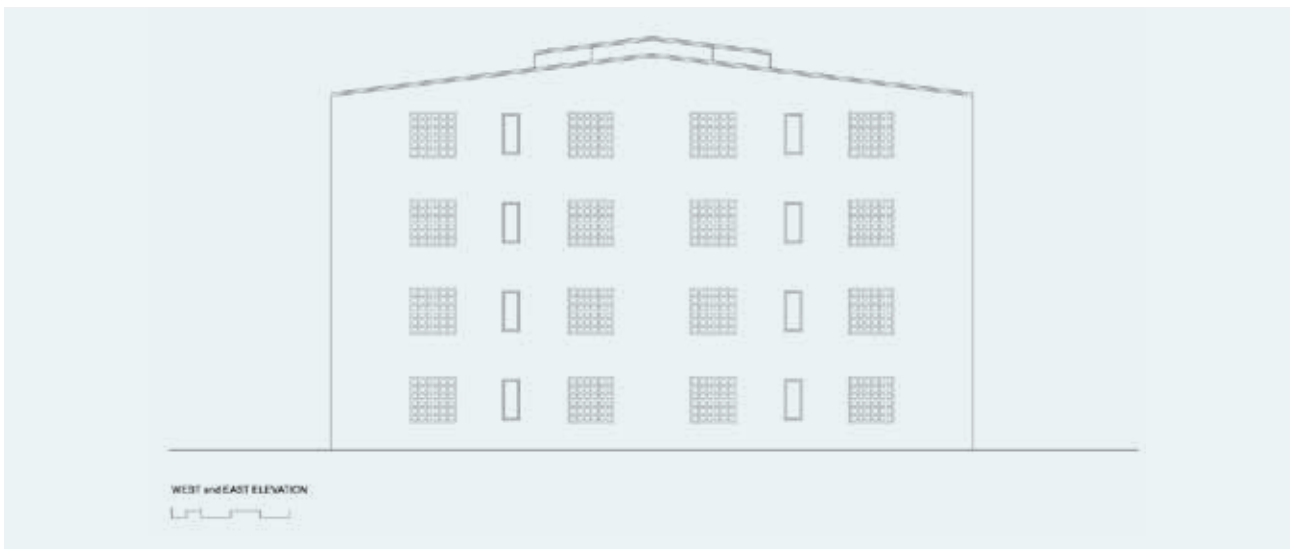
MULTI-STOREY RESIDENTIAL BUILDING (NORTH AND SOUTH ELEVATIONS)FIGURE A.5.27 MULTI-STOREY RESIDENTIAL BUILDING (WEST AND EAST ELEVATIONS)
